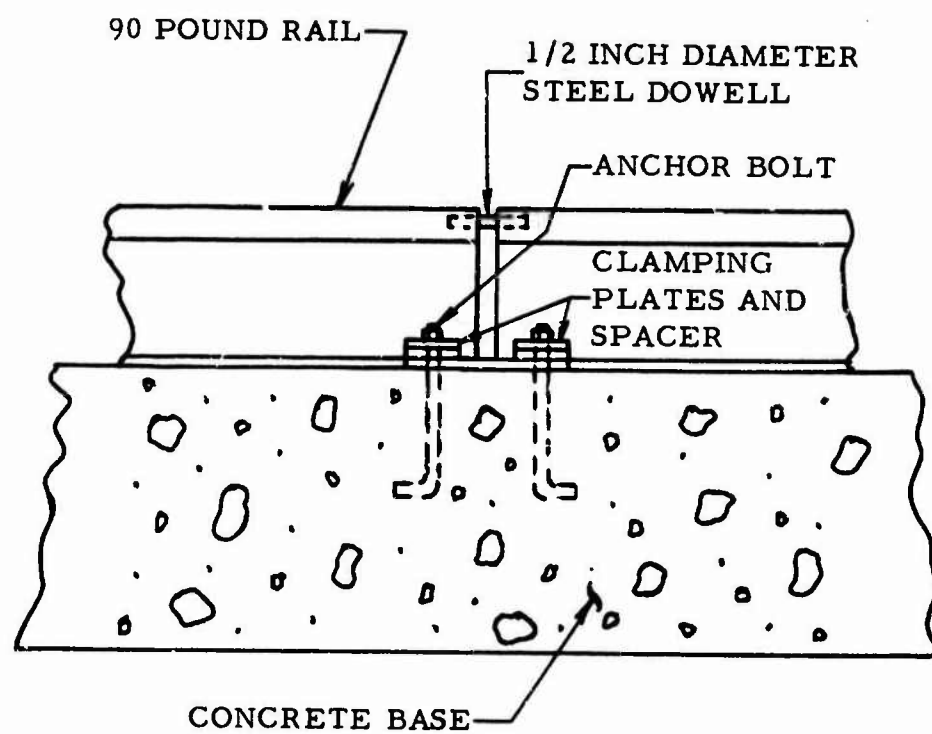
TYPICAL RAIL JOINT TIEDOWN
